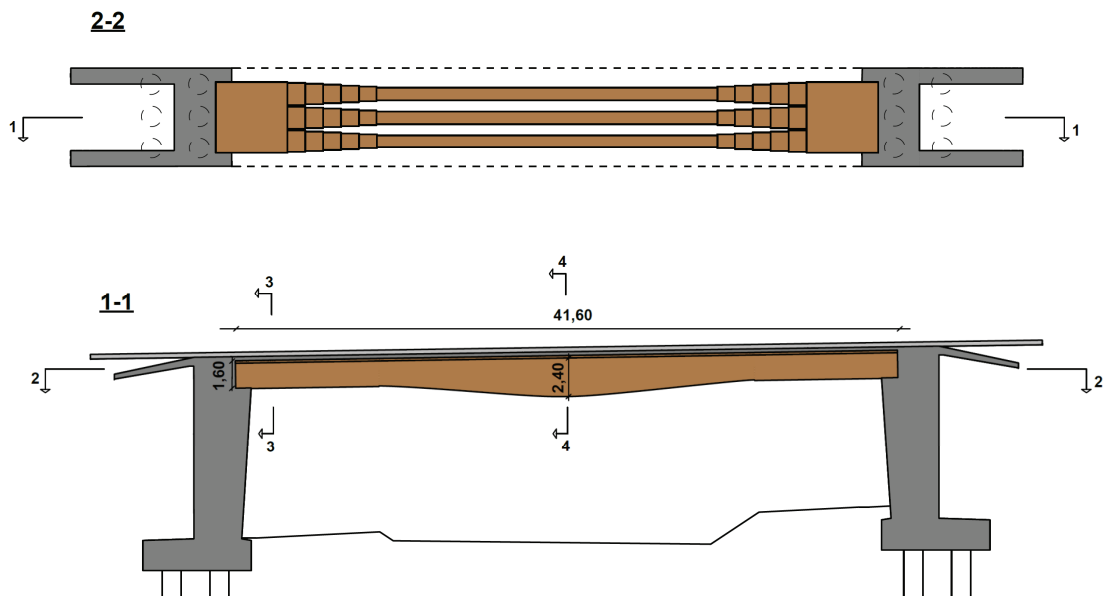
upper image: top view of the TCC bridge; lower image: longitudinal cut of the bridge
